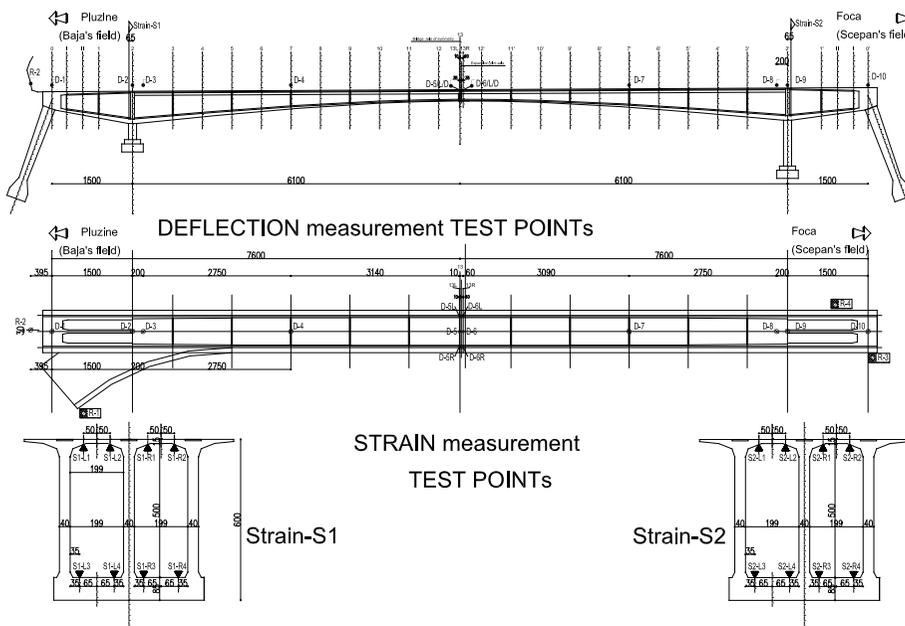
Test sections and test points of load tested *Kostova greda* bridge
